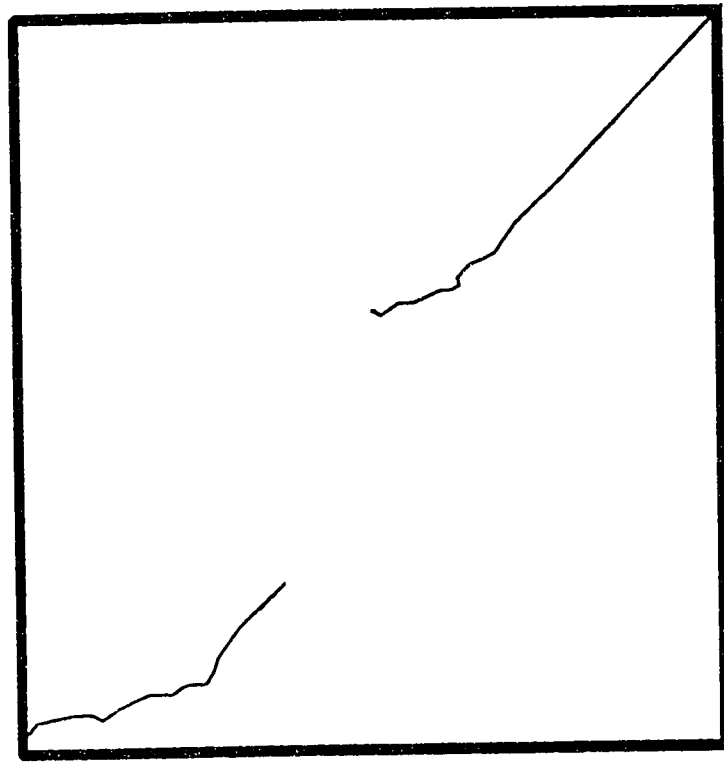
Typical Plastic Shrinkage Cracks in the Concrete Specimens Exposed to a RH of 50 % and Temperature of 35 °C
